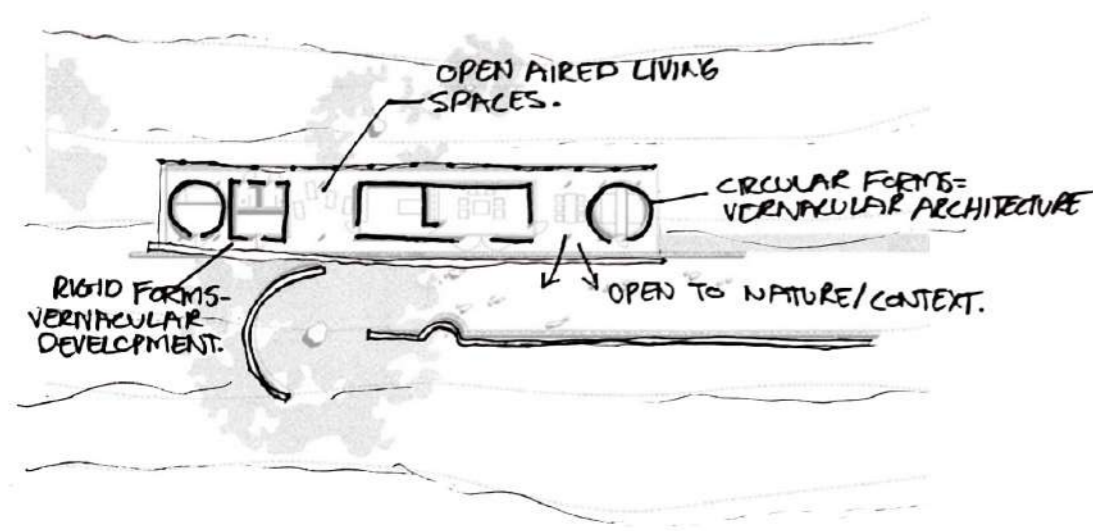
Villa Eila floor plan analysis (Adapted by Author: (chilearq, 1995: online))
